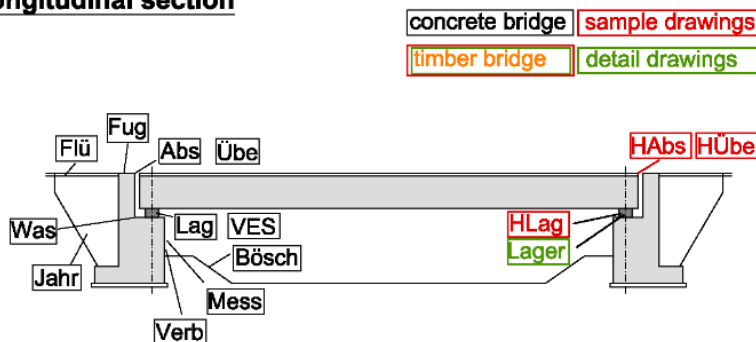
Longitudinal section of a bridge with details in approved specification drawings for concrete bridges (black) [9], sample drawings (red) [7] and detail drawings (green) [6] for timber bridges
